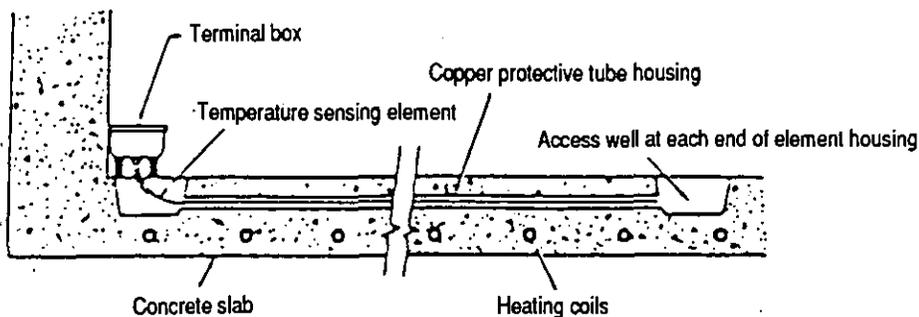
An Example of Burying a Sensor into the Ground or a Concrete Slab
